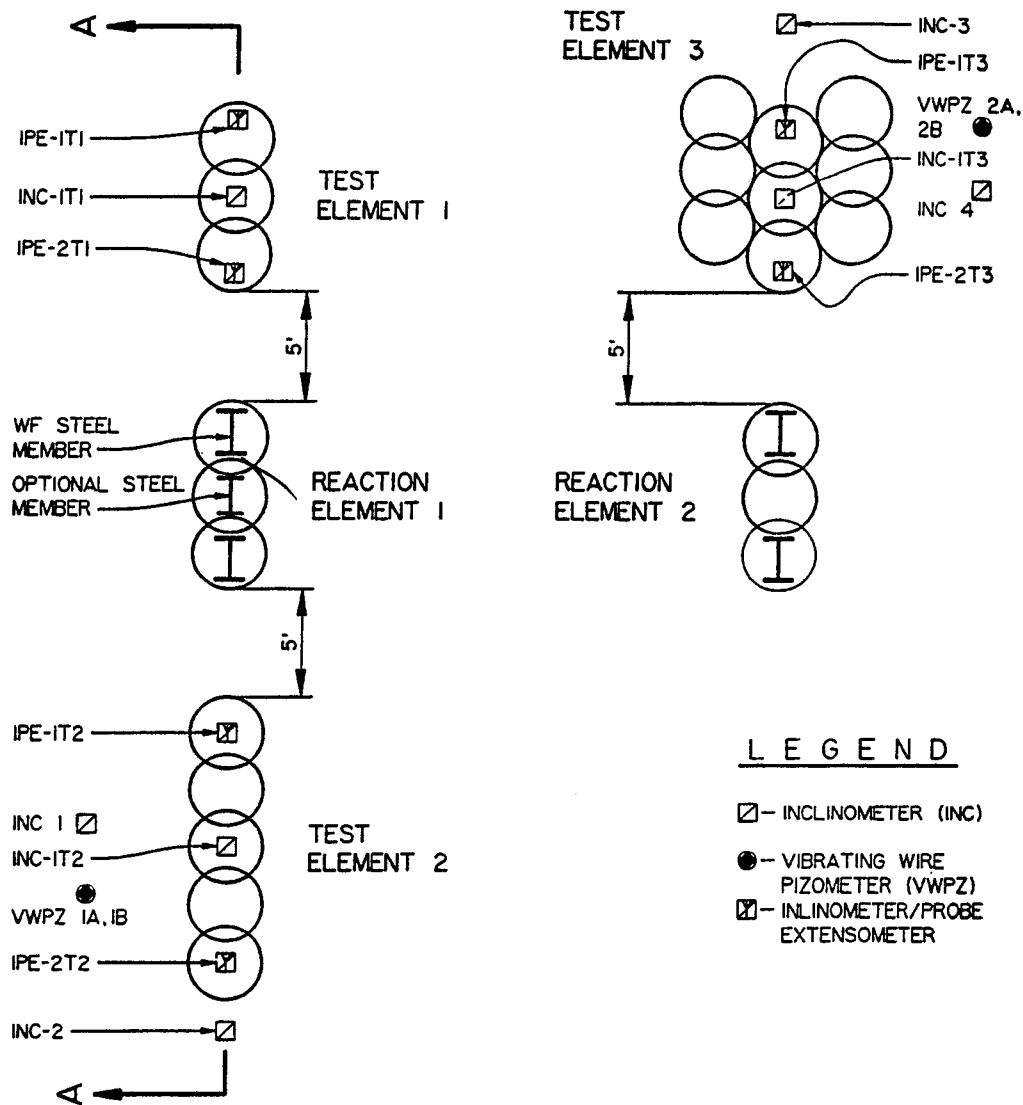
Elevation view of instrumentation layout for Fort Point Channel Work (Boston, MA) (Druss, 1998).
